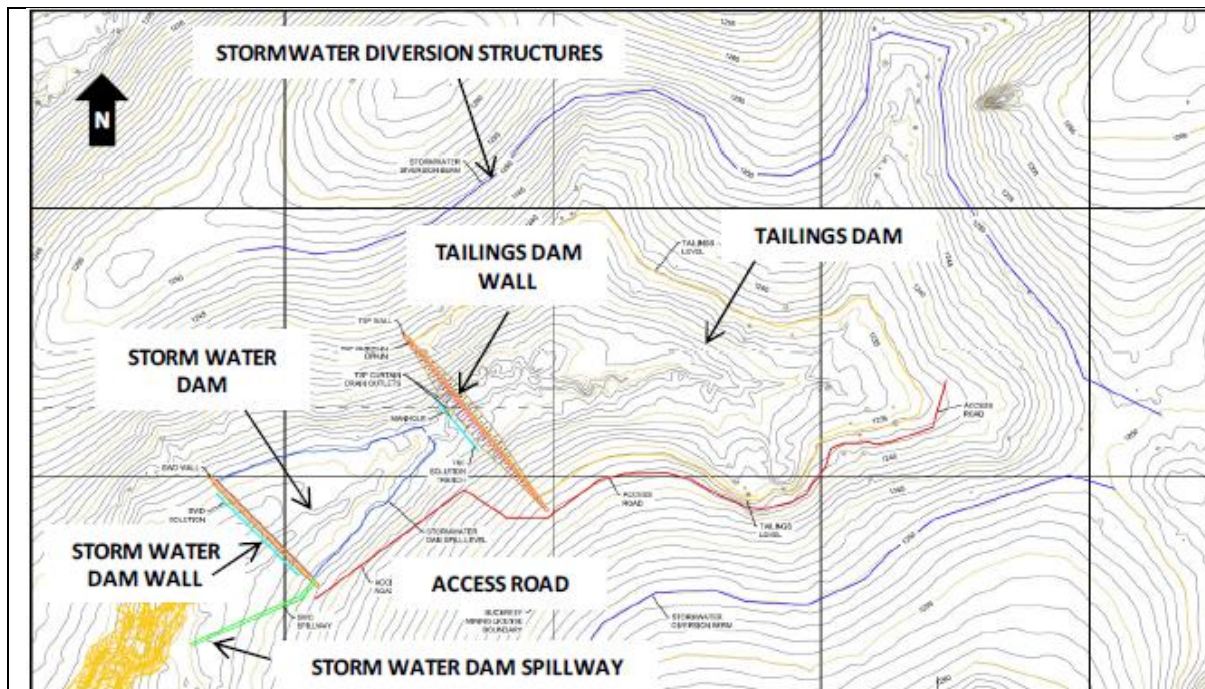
General Layout of the TSF & Storm water Dam Facility
